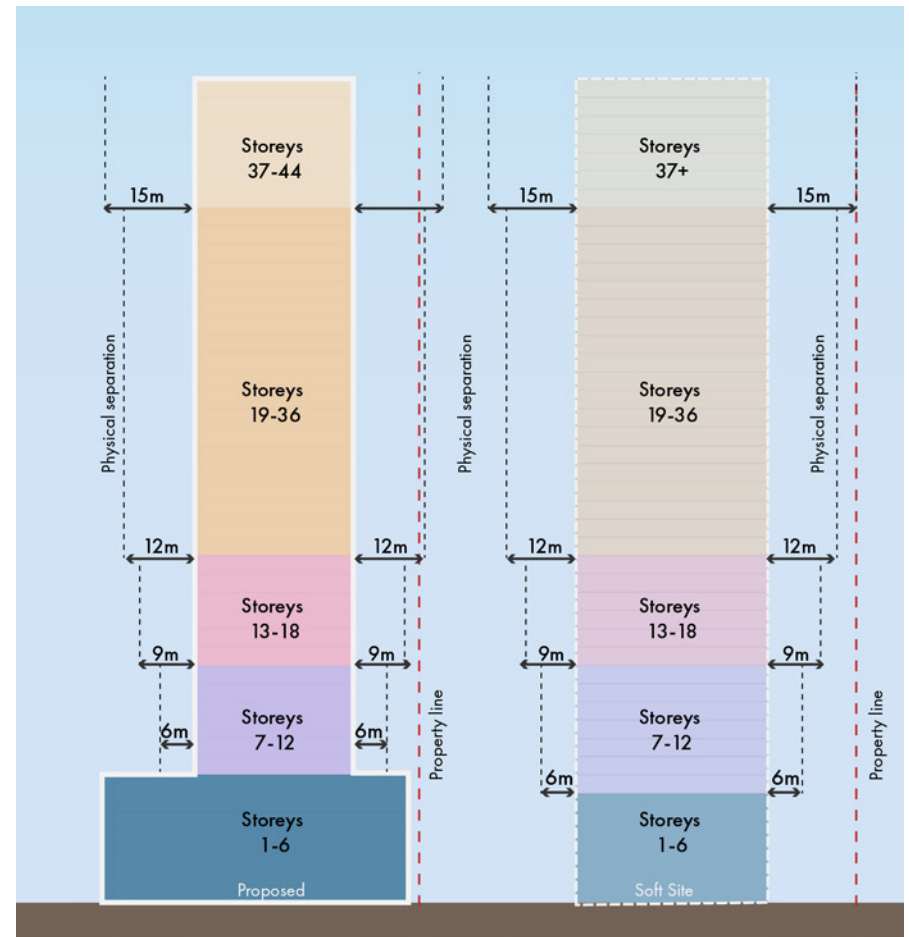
Section B showing the separation between the proposed tower and potential tower to the east
